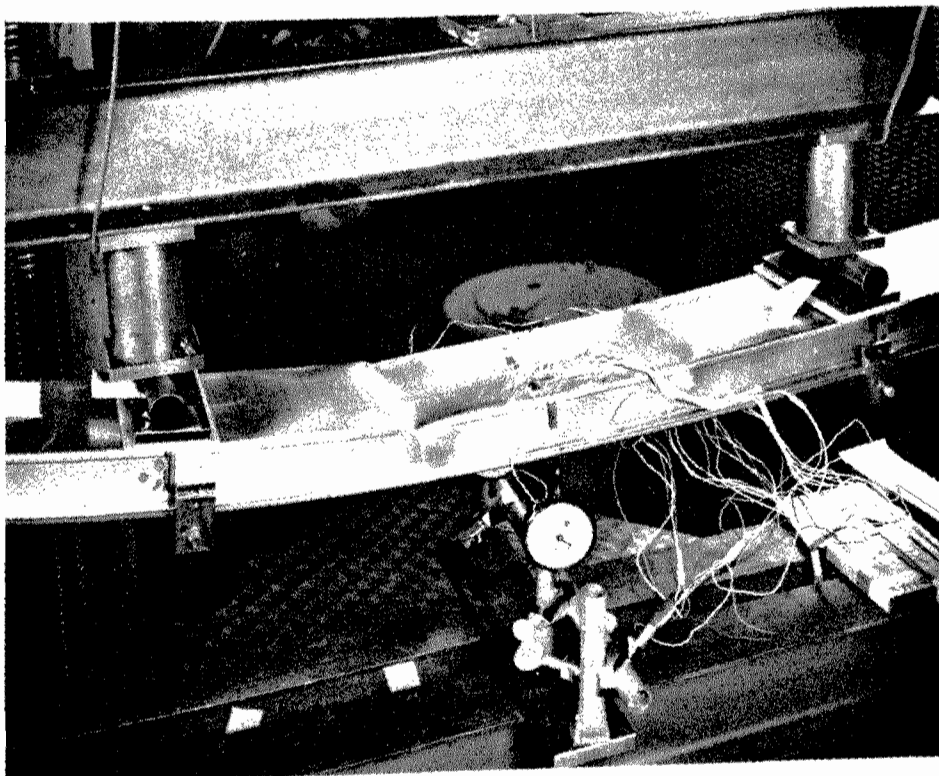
FLEXURAL SPECIMEN H301F-4 AT FAILURE LOAD
